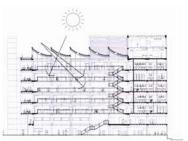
Sectional view of an atrium space with controllable shading device – Imperial College, London, UK
